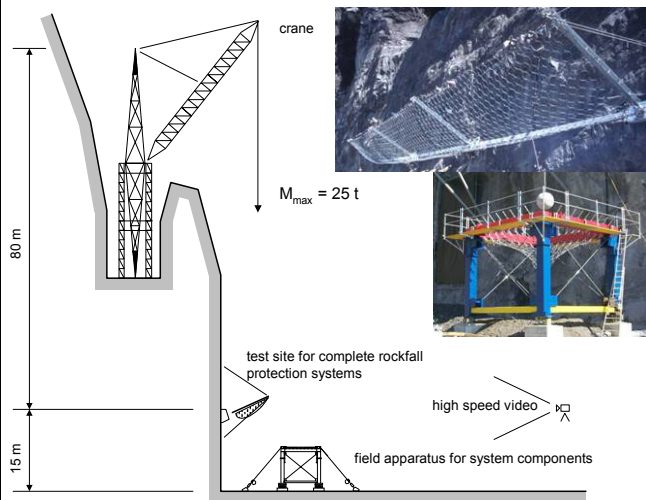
Rockfall test site in Walenstadt (Switzerland) for three span systems and single spanned nets supported in a steel frame or on cables with and without brake elements.
